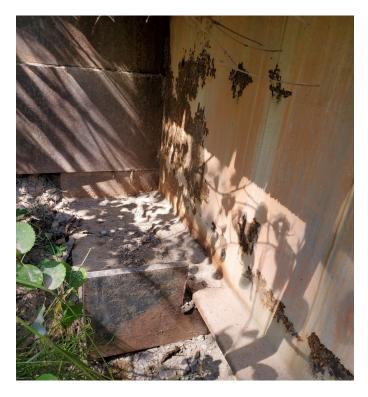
Abutment at 03788: Flat W Beam that support beam ends and steel plate backwall.
